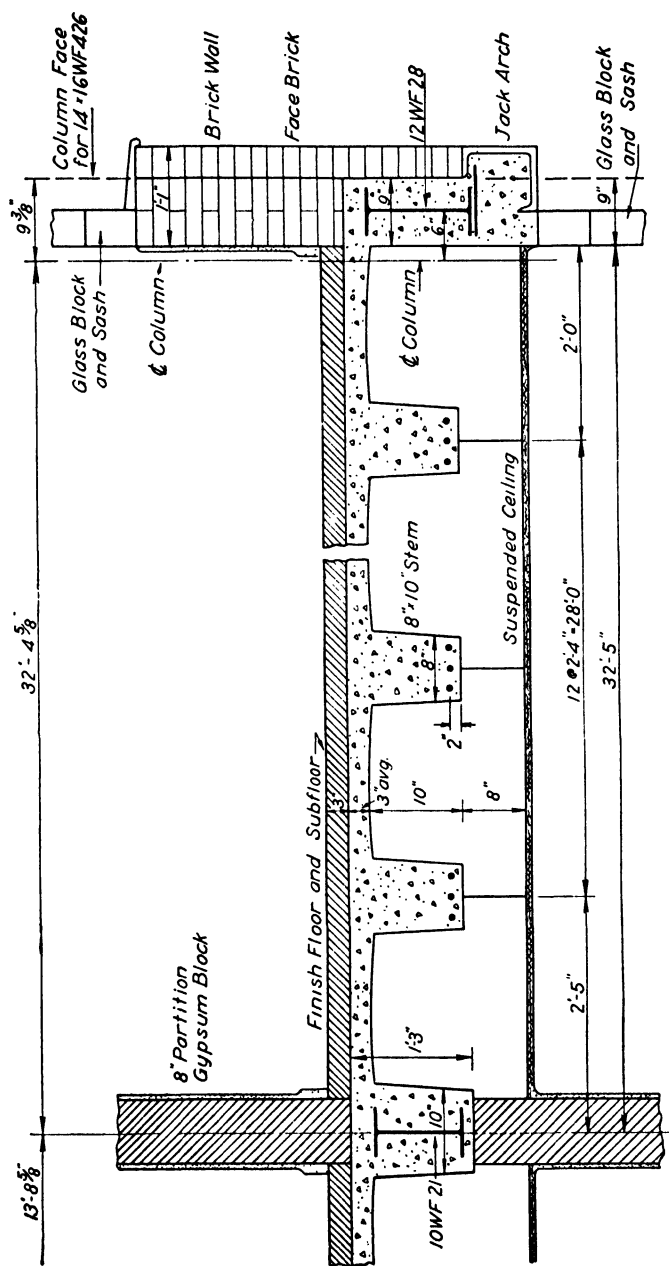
SECTION THROUGH THE CLASSROOM AT ANY FLOOR.
